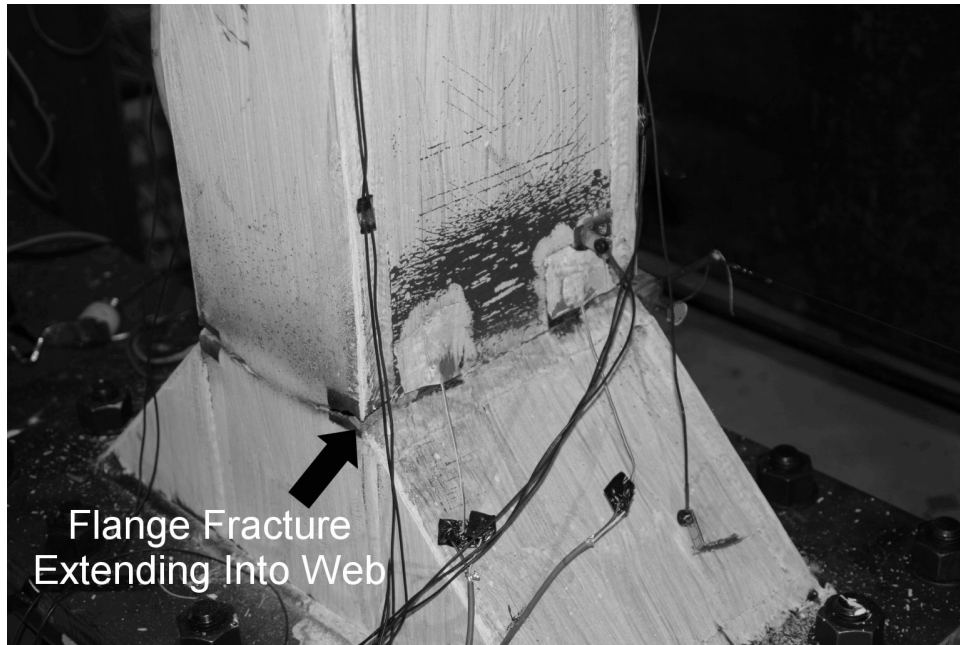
Fracture of Bottom West Flange Extending Into Web of Specimen X1L2.1
